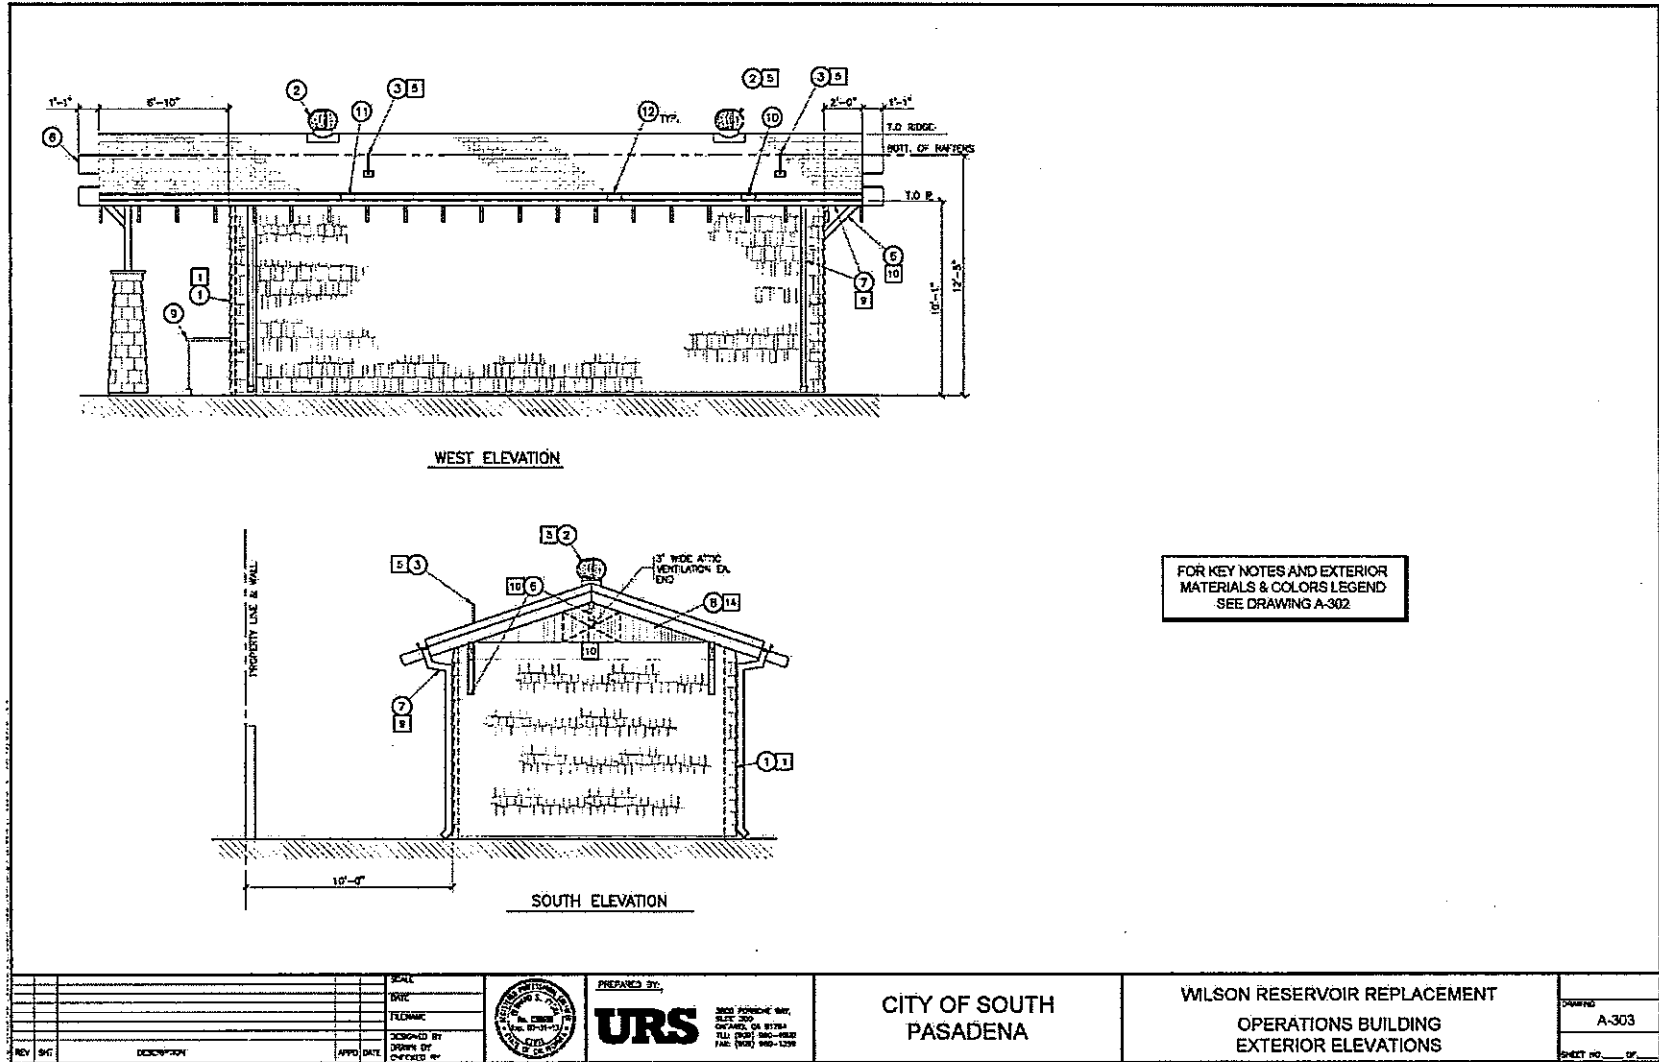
Proposed Operations Building Exterior Elevations (pg. 1)
